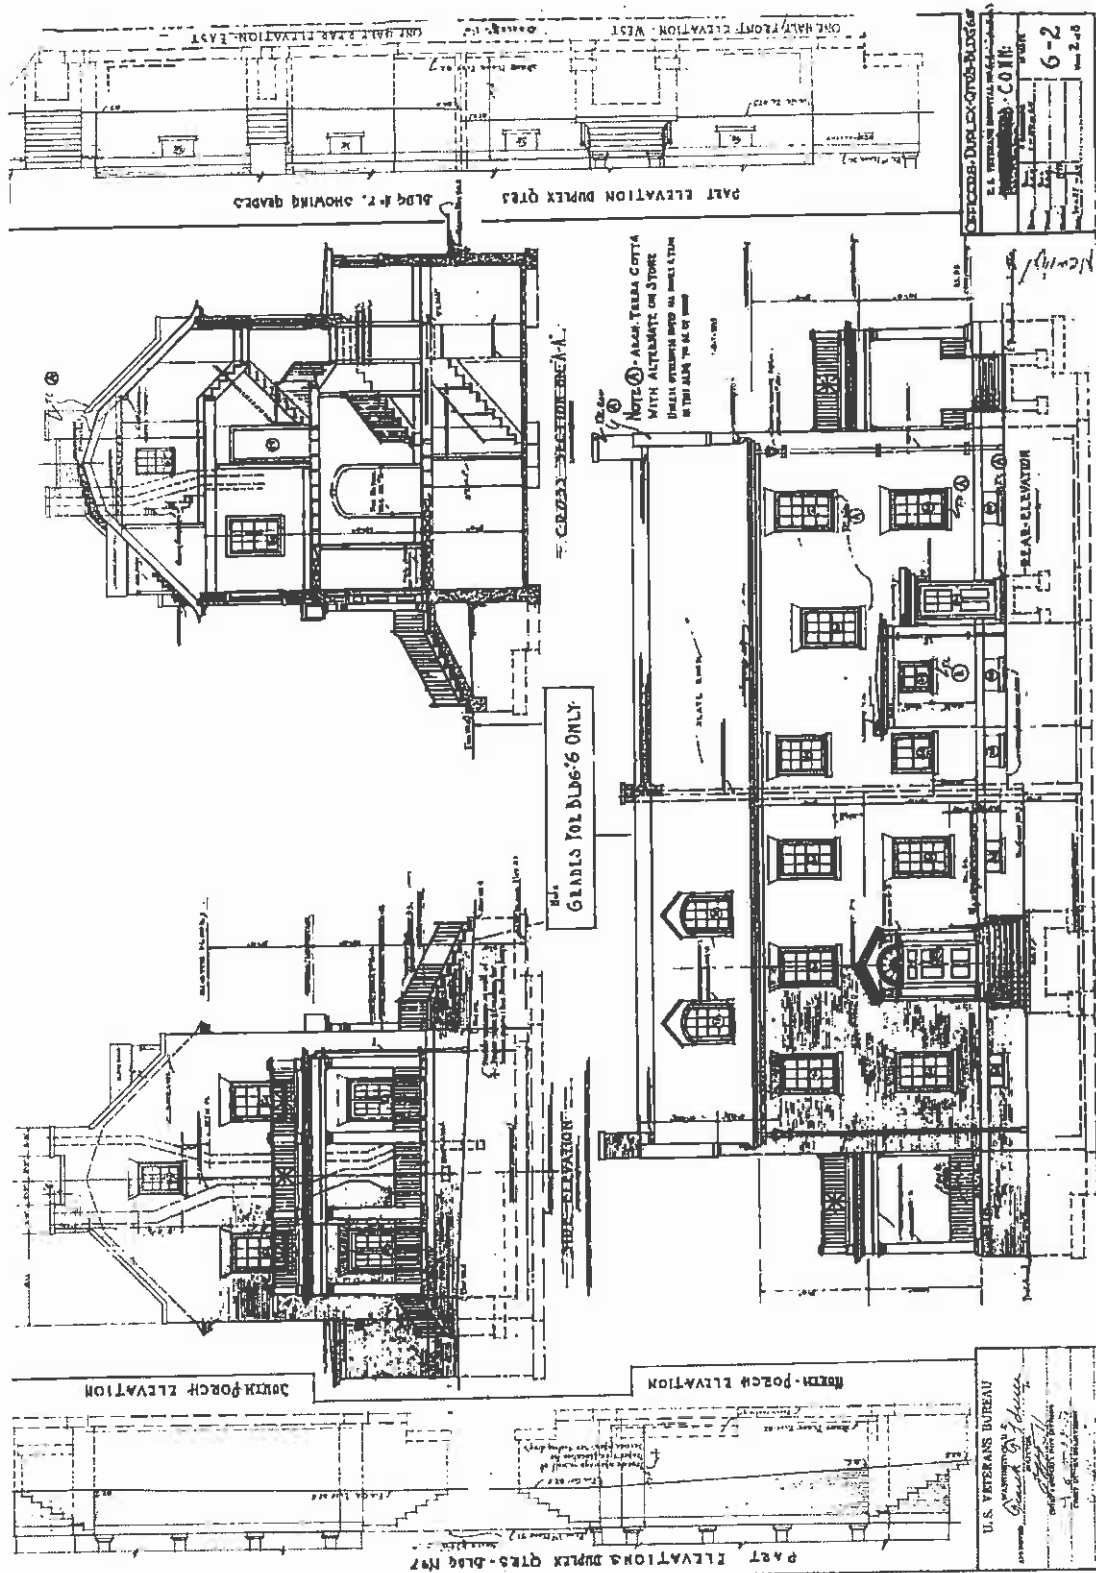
Elevations and Cross Sections, Officers Duplex Quarters, Building 6, U.S. Veterans Bureau, Newington, Connecticut, 1929 revised 1964.
